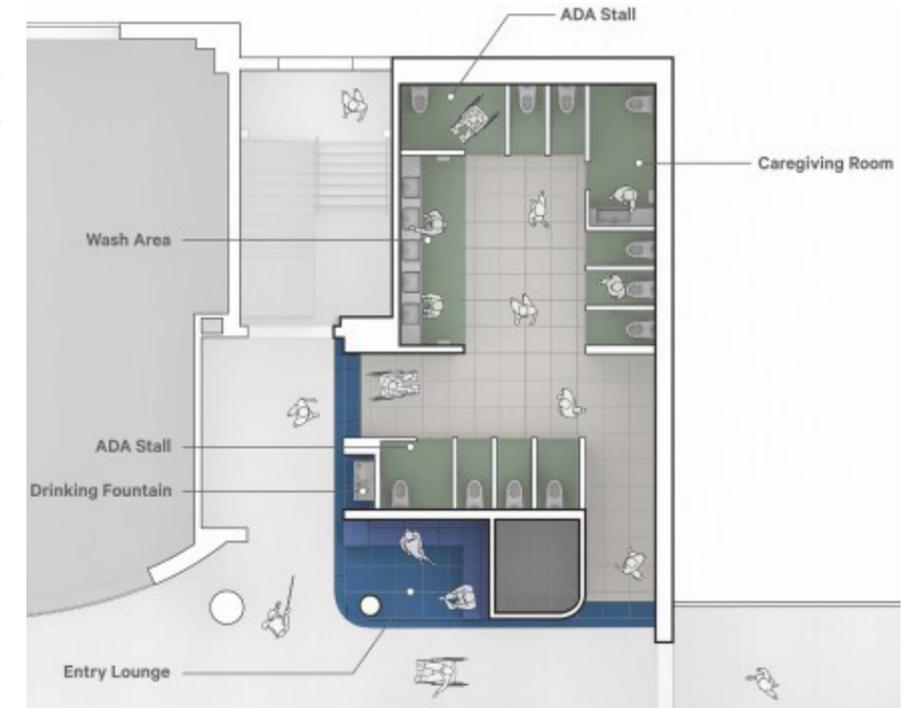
(Right) "Unstalled" floor plan with different areas labeled
